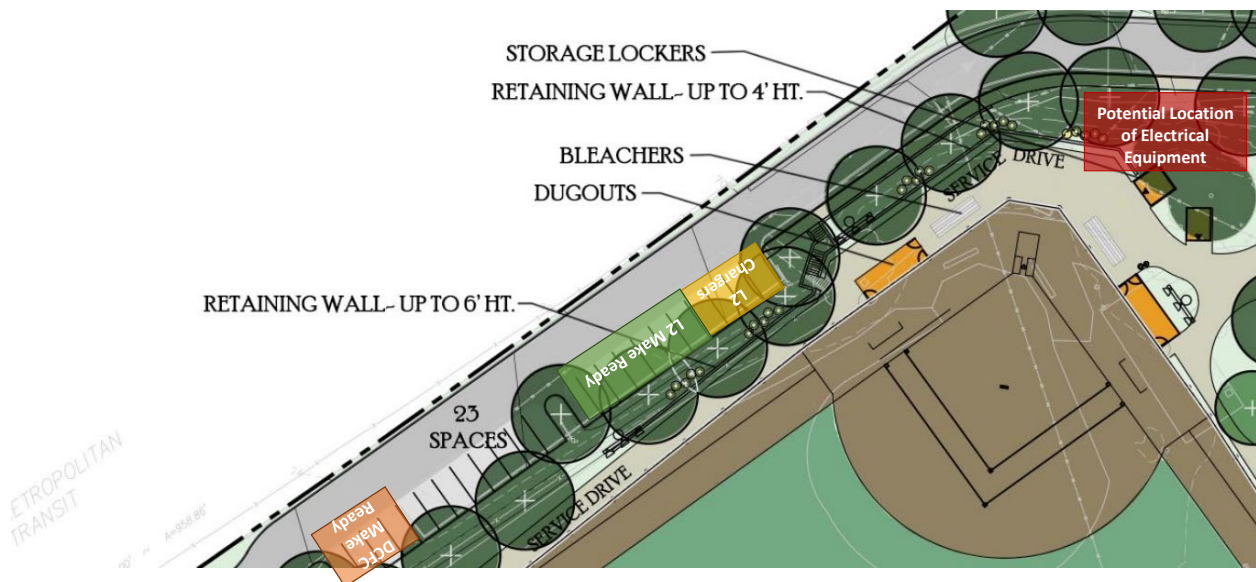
Proposed Joseph Hensley Park Charging Installation Site Plan (Not to scale)
